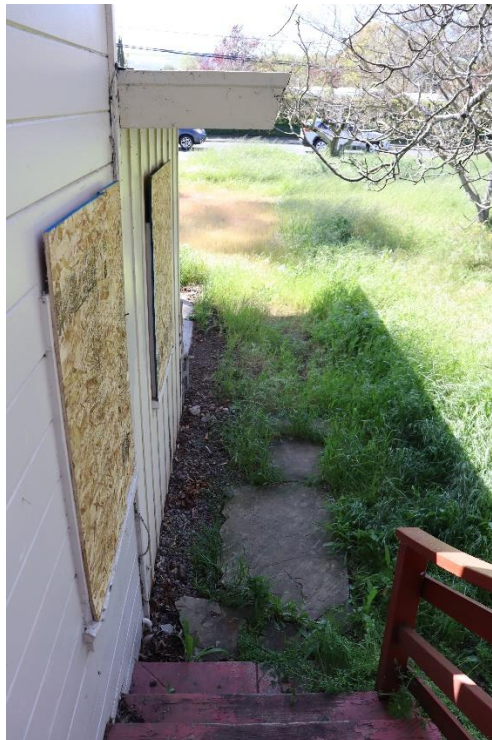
Photo showing the southeast corner of the east elevation, facing west.
